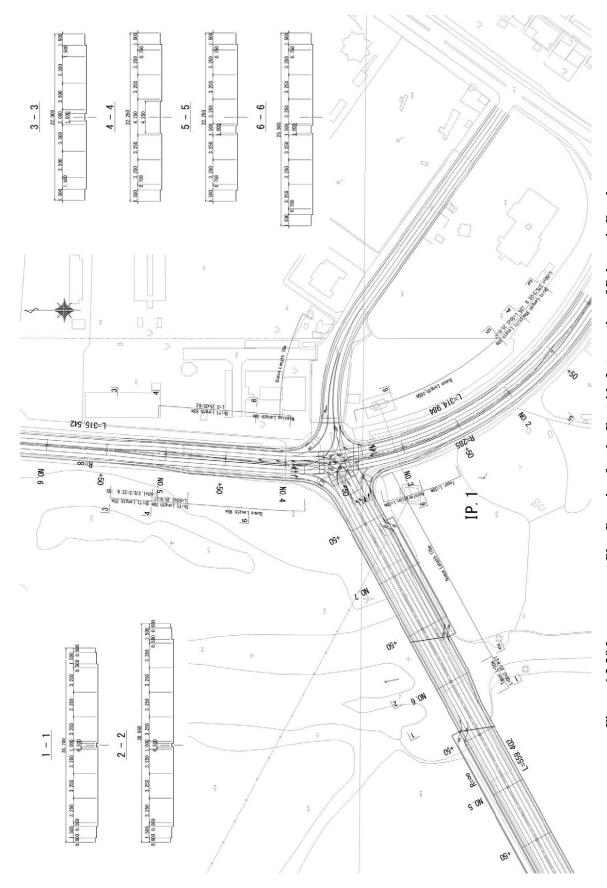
Improvement Plan Drawing for the Eastside Intersection of Palmeraie Road
